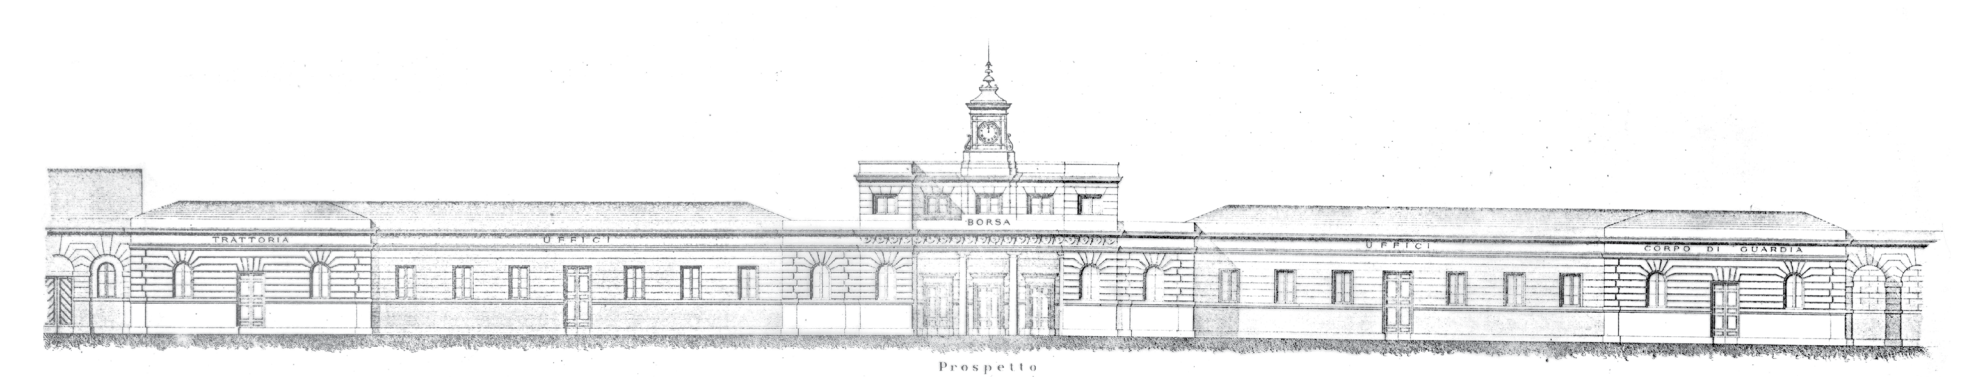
Original elevation drawing of the Borsa building and flank buildings, showing the uffici (offices), trattoria (restaurant/eatery) to the left, and uffici (offices) and Corpo di Guardi (police post) to the right.
